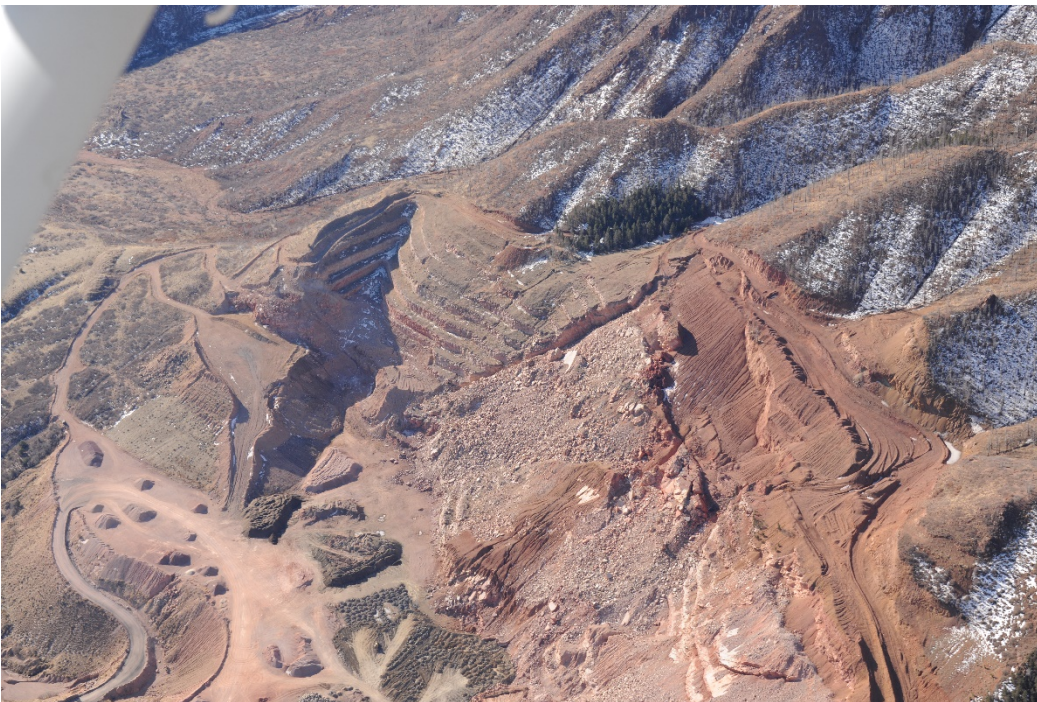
Grading at crest of highwall (1/24/2020 aerial photo, looking south).
